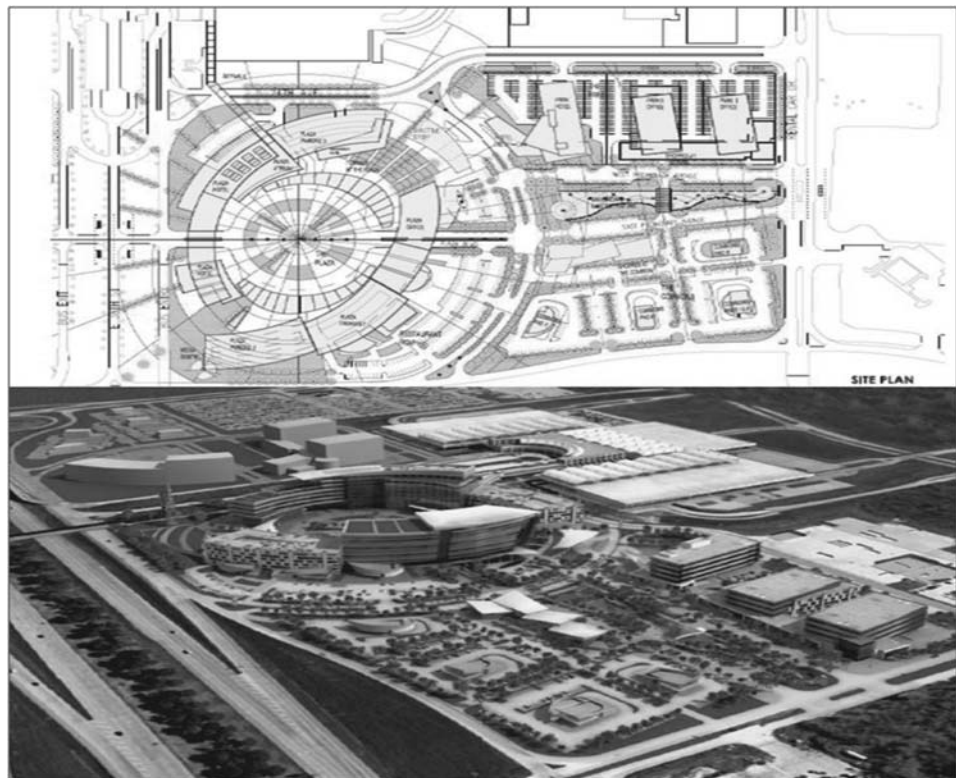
Plan and rendering of Southgate Plaza (10).
